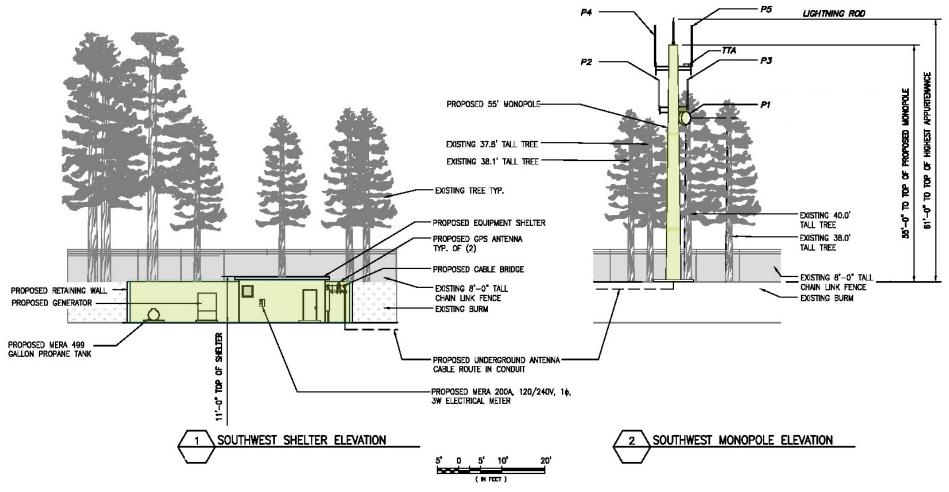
Site 26 - Mill Valley Water Tank Proposed Elevations
